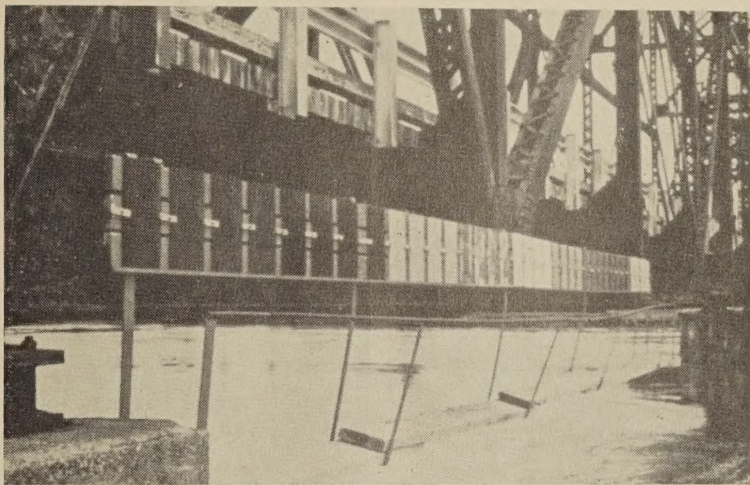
Panel arrangement at exposure B on east end of northern lower chords of Mile 28 Bridge.
